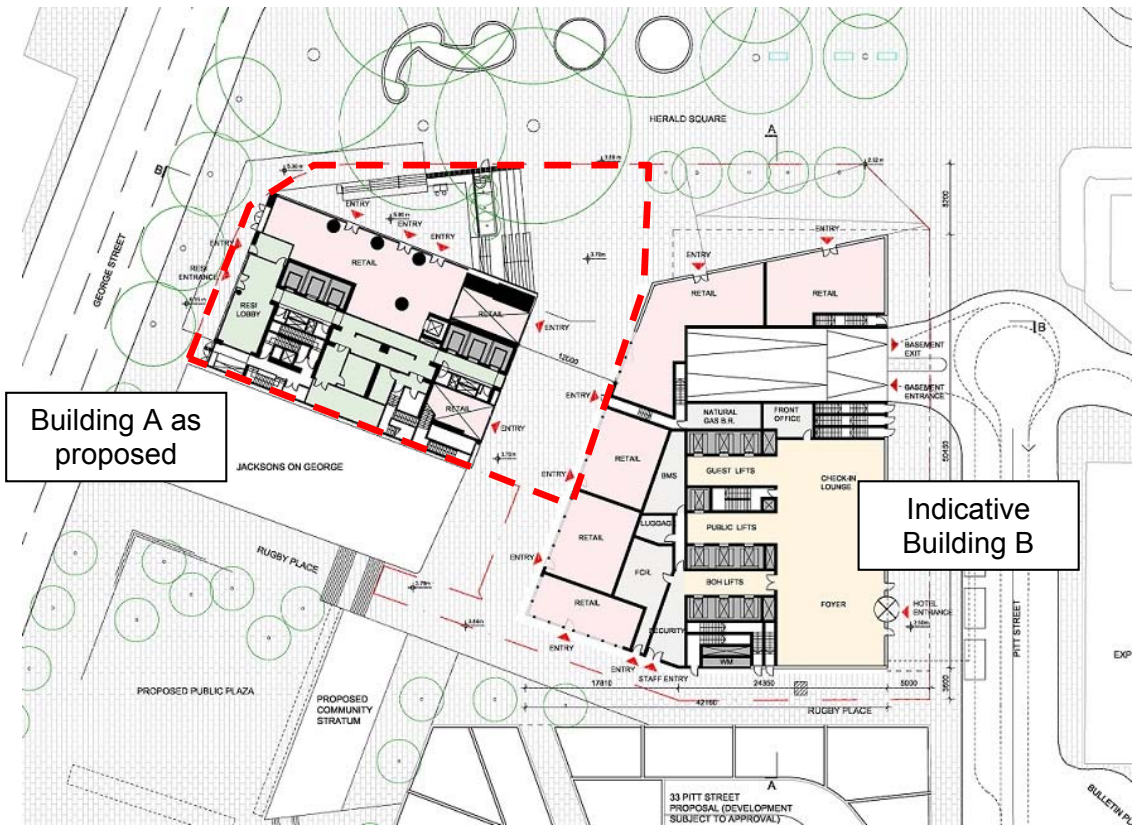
Ground floor relationship between Amended Building A and proposed indicative hotel building under Stage 1 DA
